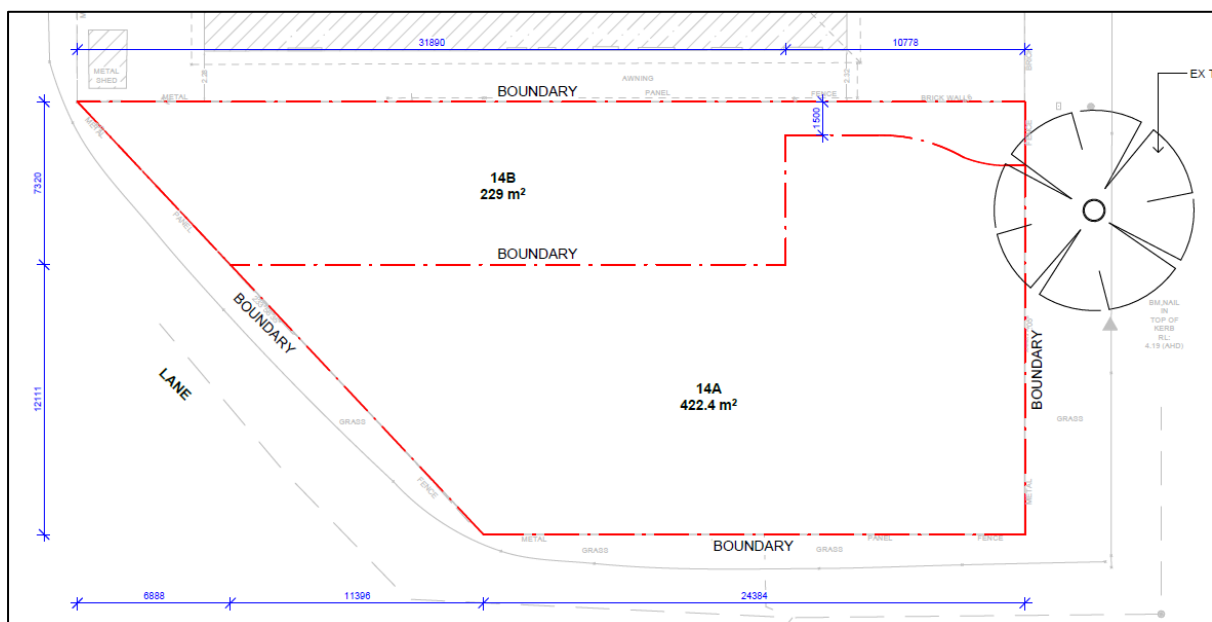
Proposed Subdivision Plan (Source: NININ Studio)
